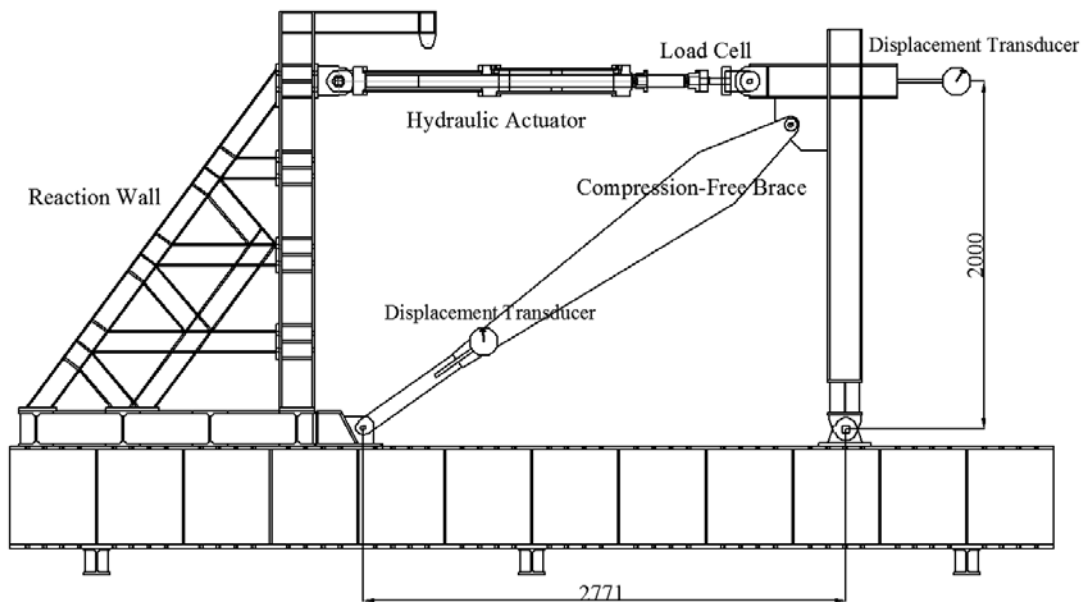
Schematic Diagrams of Test Setup of Compression-Free Brace in Steel Frame Sub-assembly (dimension in mm)
